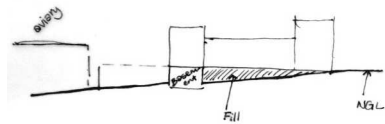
Section indicating slope of the site, indication a 2.8m fall in the topography (Author 2020)
